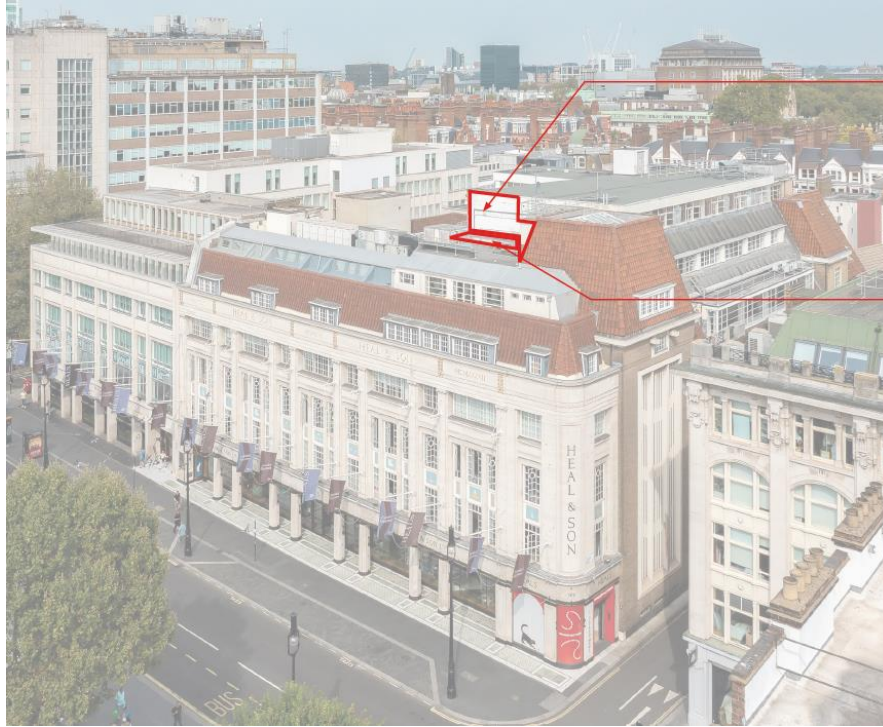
Sixth Floor Roof Terrace Location (Source: Design and Access Statement, prepared by White Red Architects)
